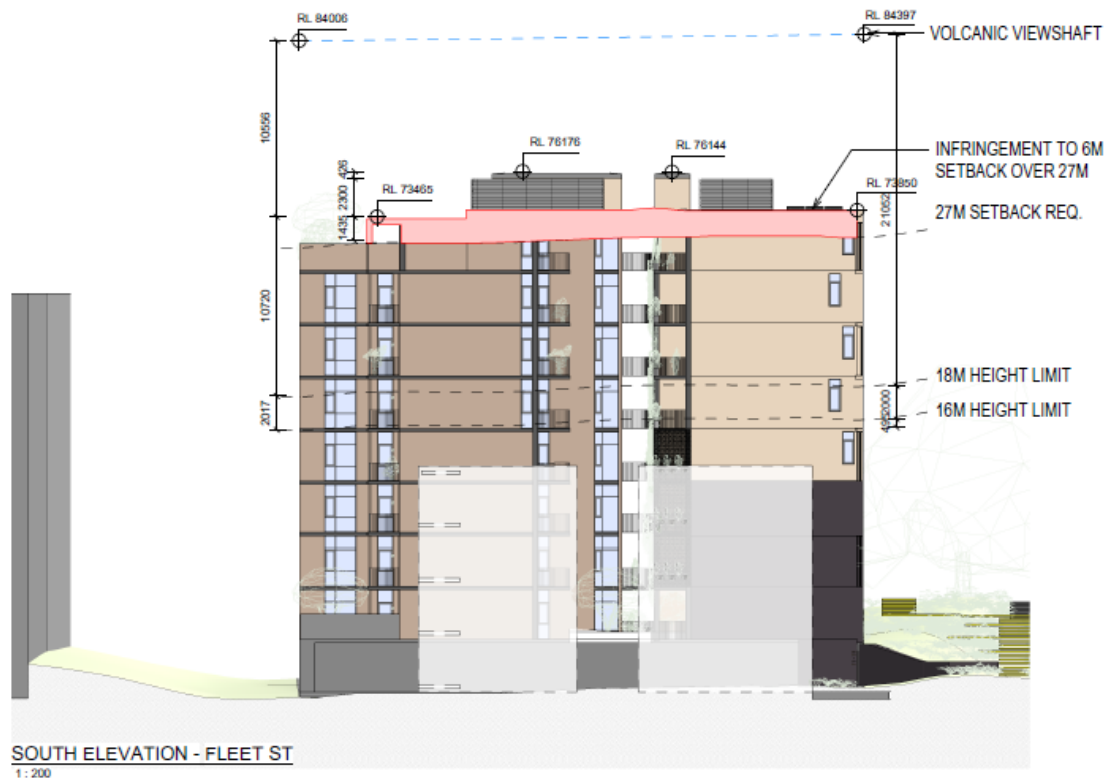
Southern Elevation of Building. Identifies overheight component of building, central core and circulation space providing break in building and the infringement to the 6m setback over 27m. Source PBA 938-RC200
